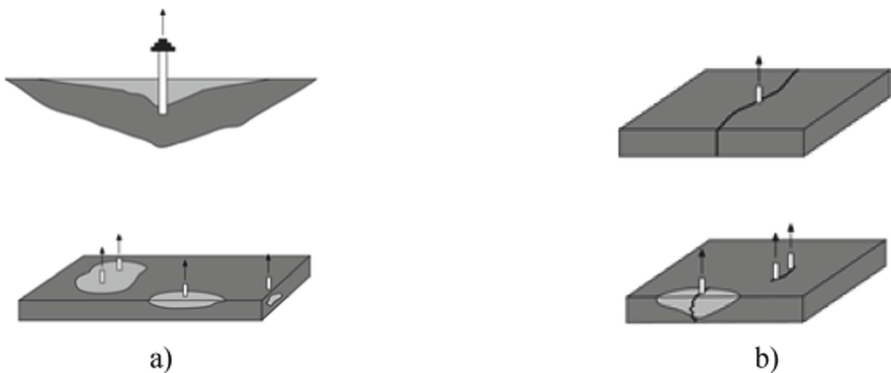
a) Type of failure "Concrete Rapture", b) Type of failure "Splitting".
